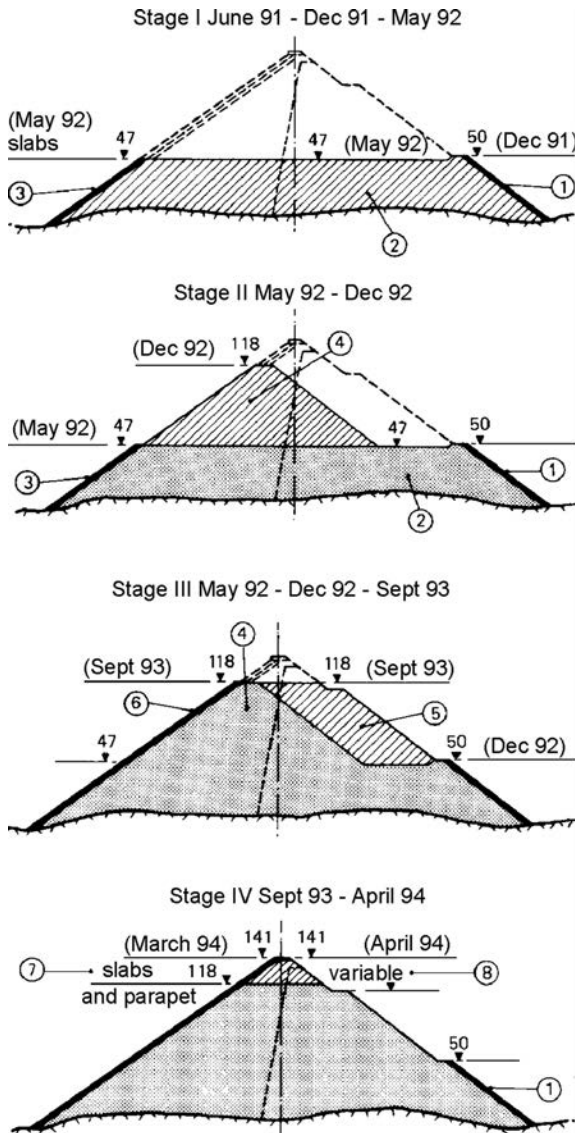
Construction of the body and facing of Xingo dam, in stages. (1) Roller compacted concrete; (2) rockfill up to elevation 47 m; (3) slabs of the facing – stage I; (4) rockfill up to elevation 118 m; (5) rockfill – downstream, up to elevation 118 m; (6) slabs of the facing – stage II; (7) slabs and parapet wall – stage III; (8) rockfill up to elevation 141 m.
